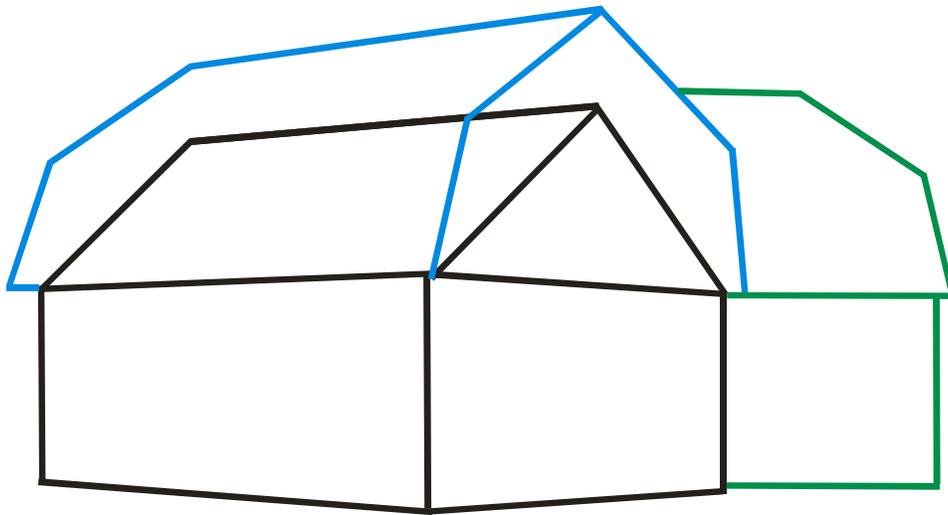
The evolution of the Doucet-Hennessy House roof. The first structure (black) was erected, then an additional level with a new roof (blue), and finally an additional wing and roof was added later on (green).
